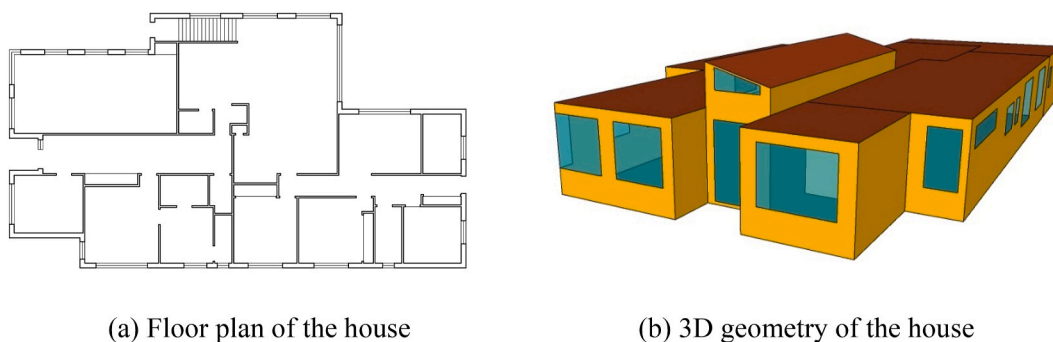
(a): Floor plan and (b): 3D geometry of the house.
